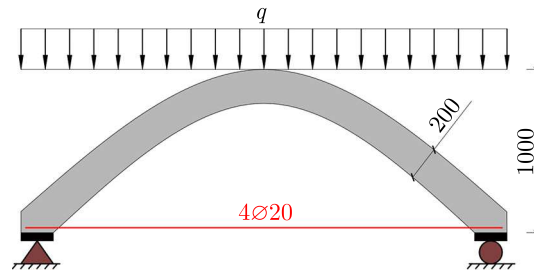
Dimension and reinforcement layout of tie-arch examples (unit: mm)
